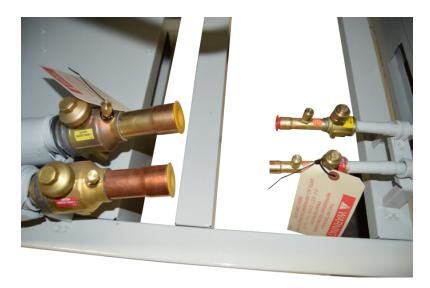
Ball Valves Installed on a Condensing Unit as Shut-off Valves
